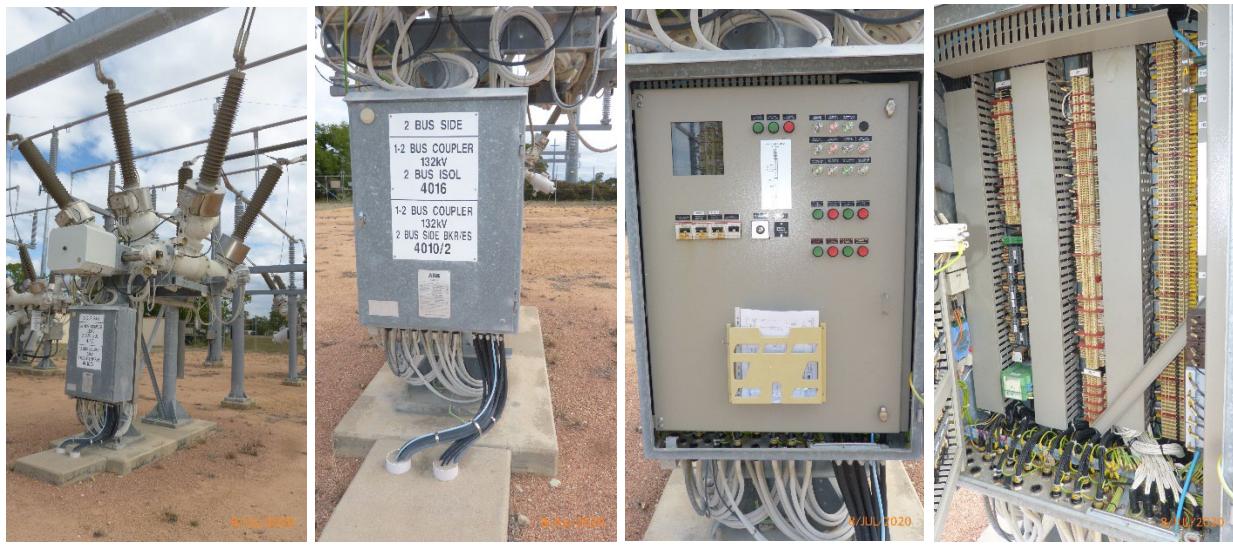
T150 132kV Alan Sherriff Substation Secondary Systems Building +1
